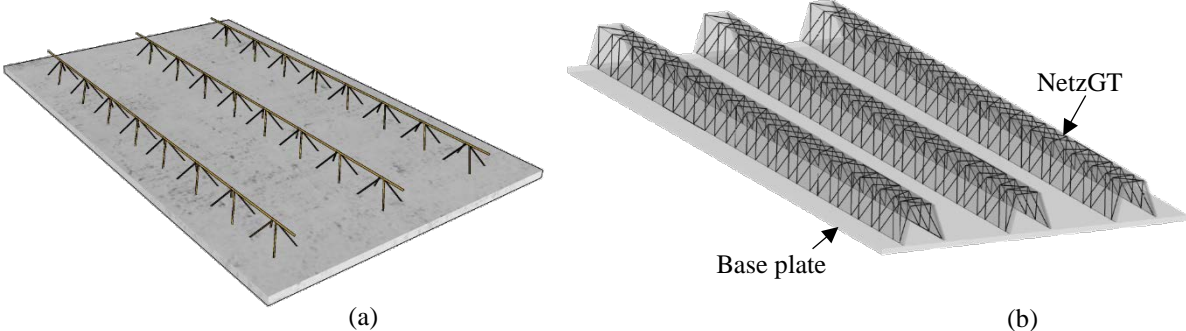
(a) Steel lattice girder in concrete slab (b) Concrete slab reinforced with NetzGT elements
